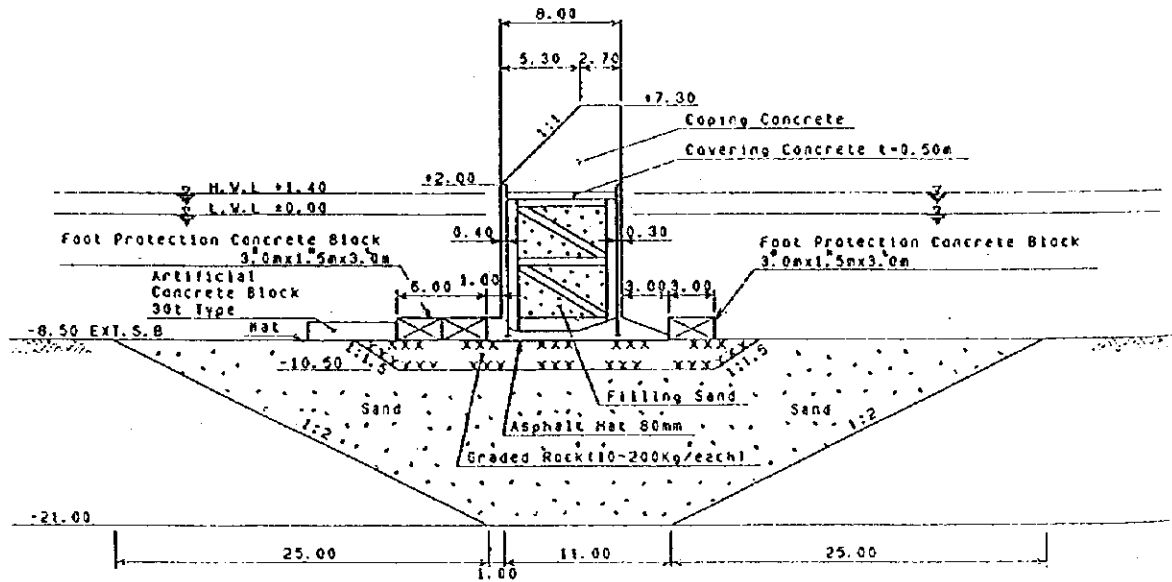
Typical Cross Section of Breakwater in Lien Chieu (Hybrid Caisson)
